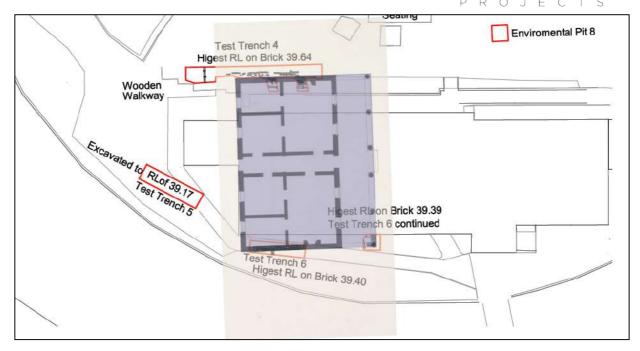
Overlay of Surgeons Cottage Plan (1824) on archaeological survey plan
